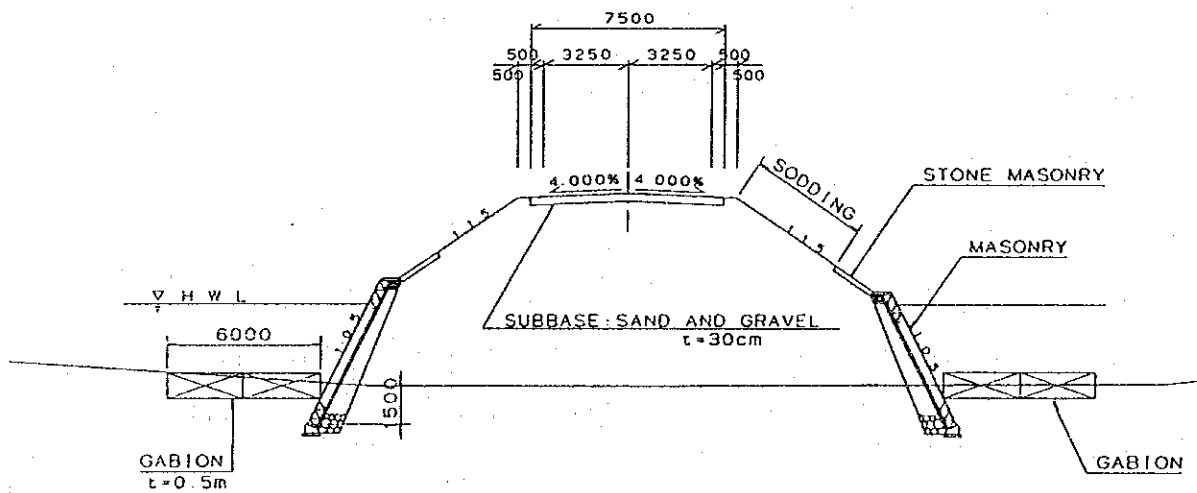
Standard Cross-section of Approach Roads on Flat Areas
